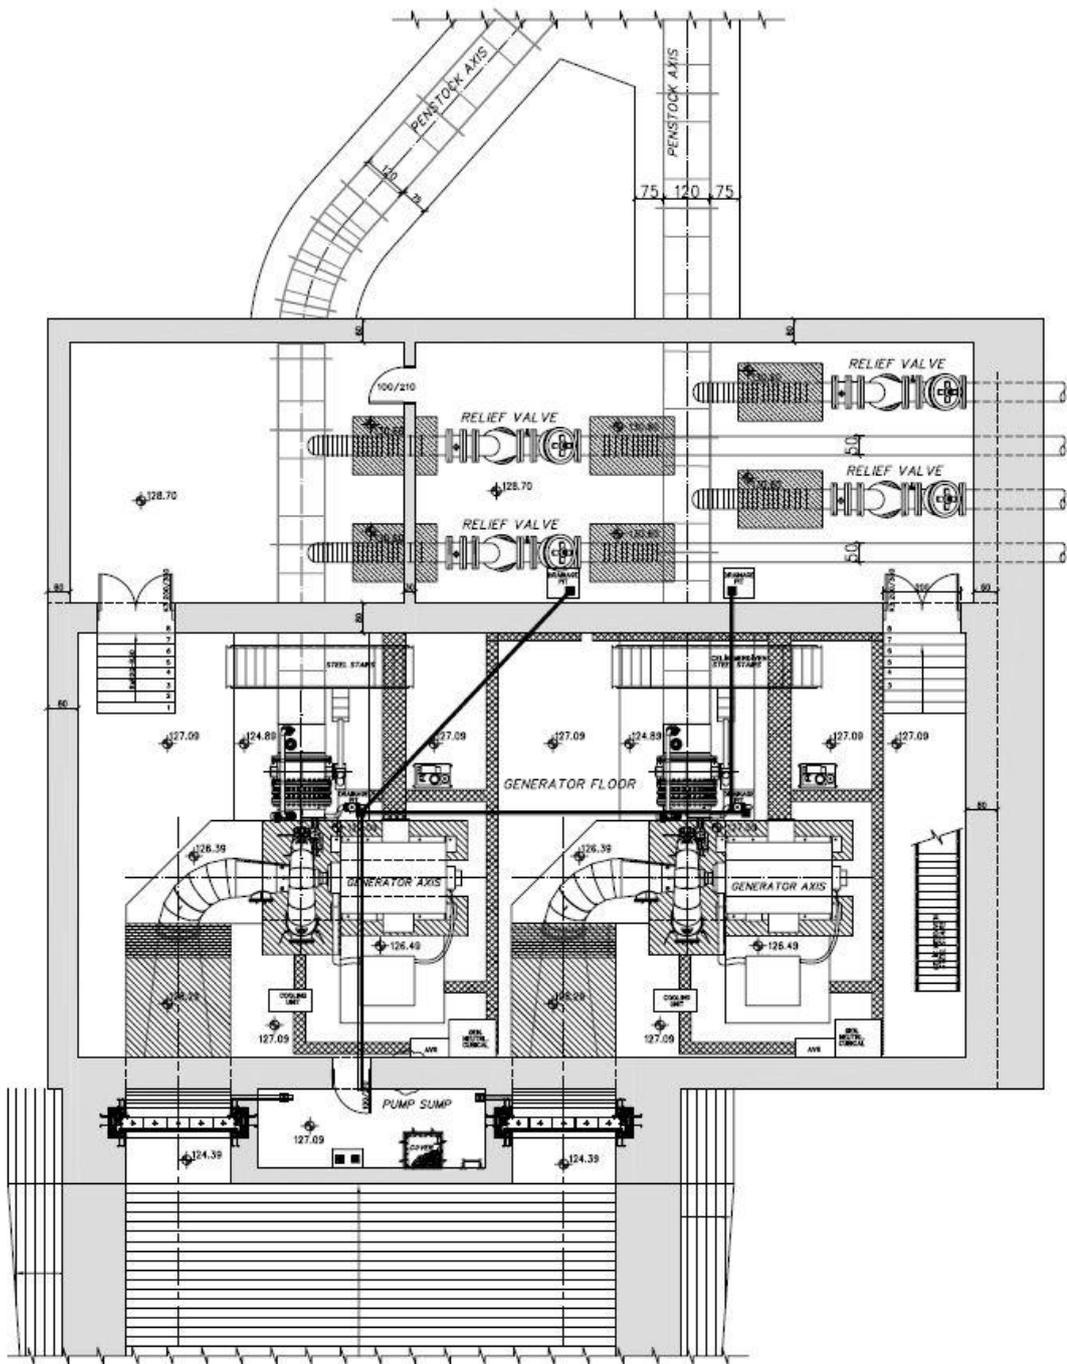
The General Layout of Yesilvadi Powerhouse
